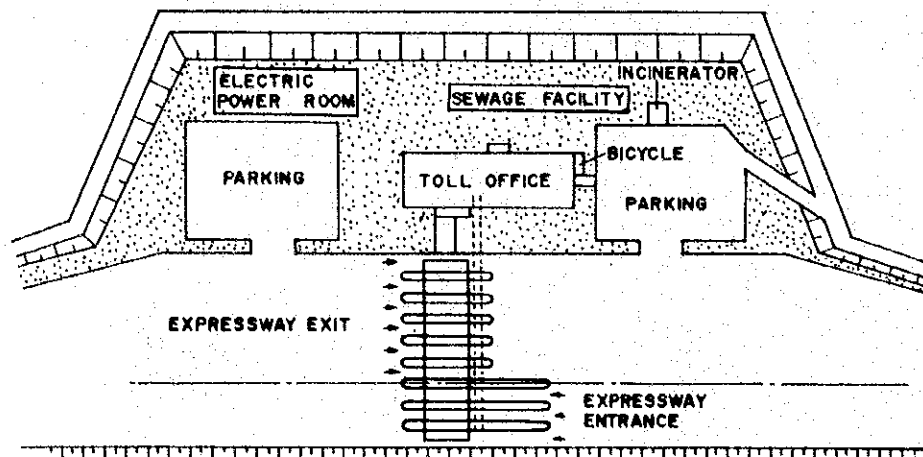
TYPICAL LAYOUT PLAN OF INTERCHANGE TOLL OFFICE
